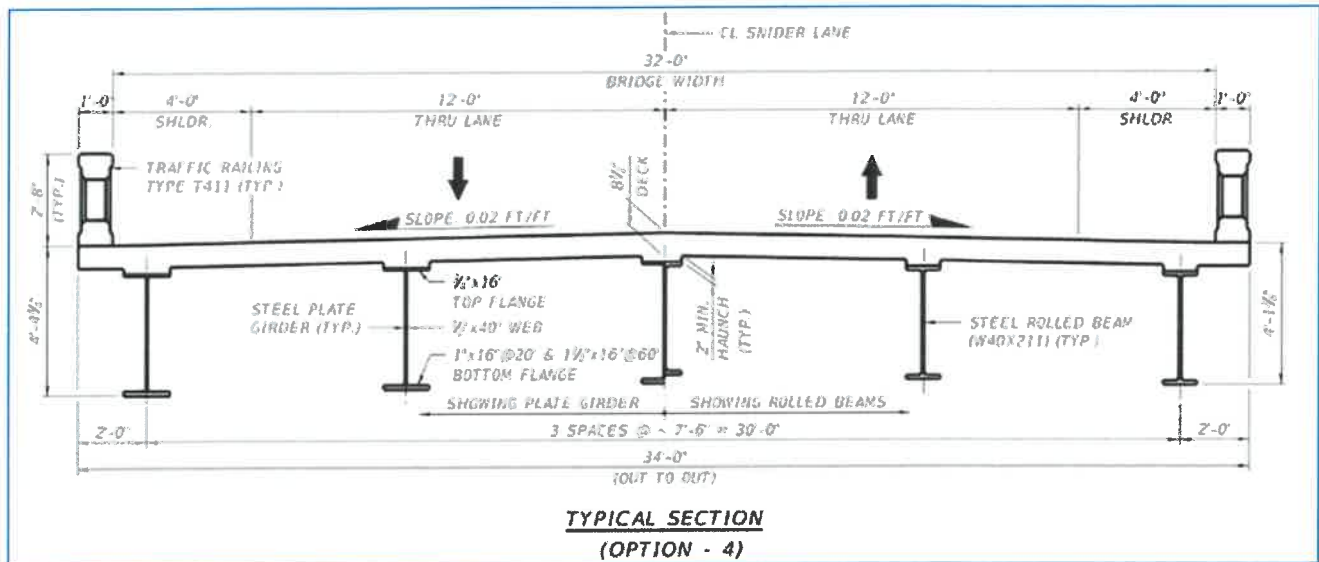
Steel Plate Girders (40"X1/2" Web) or Steel Rolled Beams (W40X211) Typical Section
